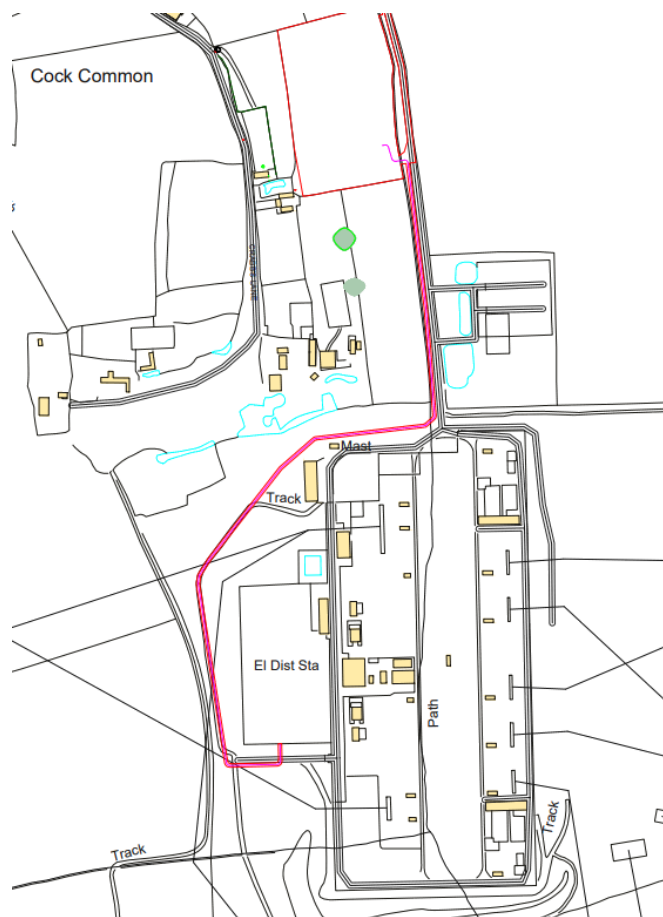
Proposed Block Plan of the battery energy storage system.
